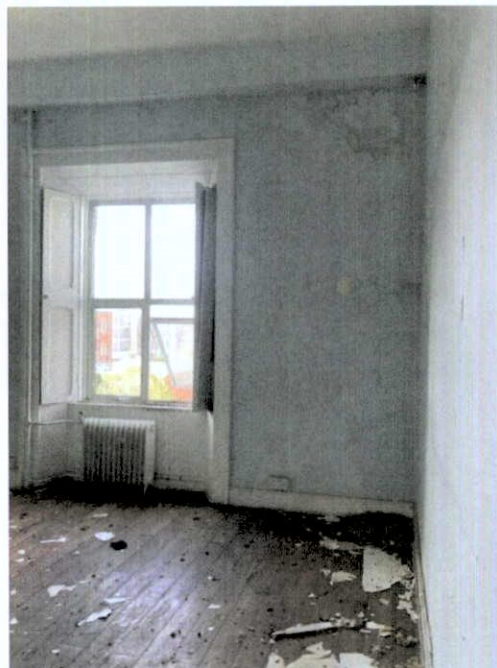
Damage to ceiling and wall fabric due to water ingress.
